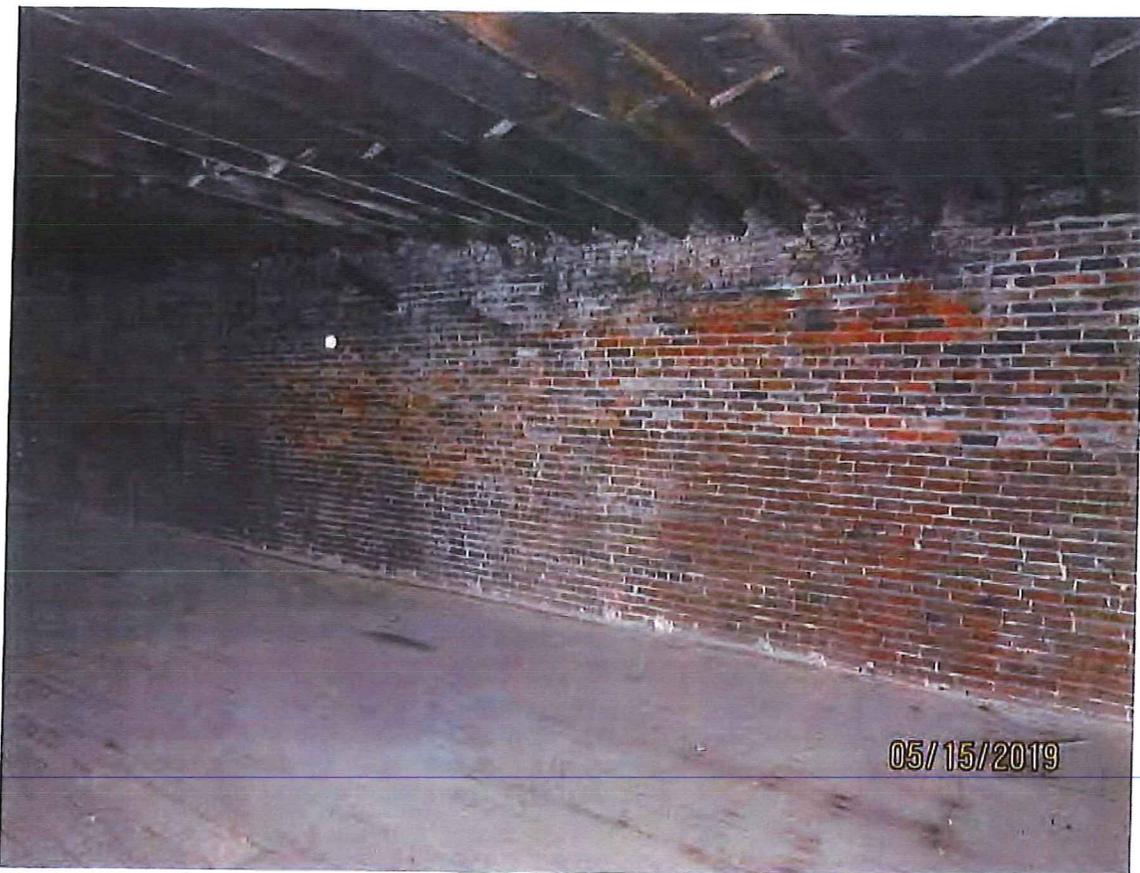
Deterioration of bricks / mortar at right wall on fourth floor.
